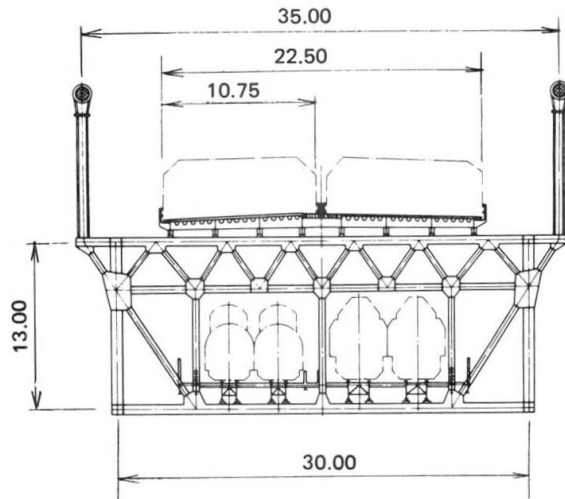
Section of Bisan-seto Bridge      Fig. 8 Example of Photomontages
